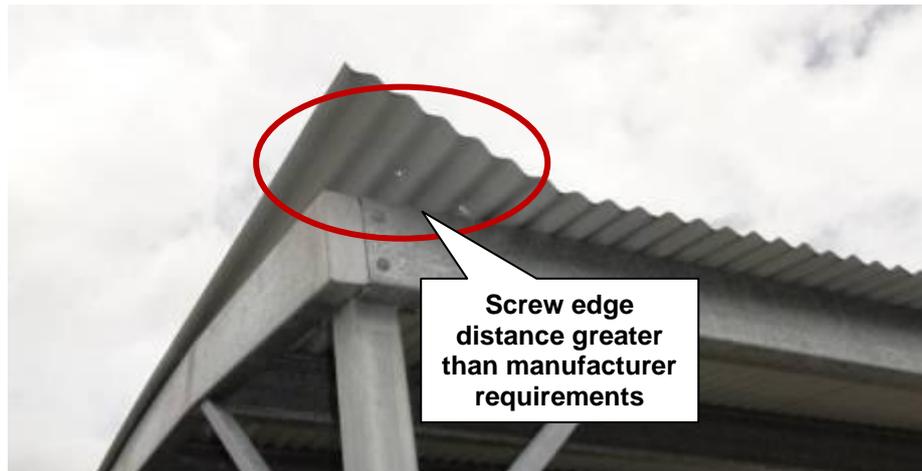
Large edge distance led to fatigue failures in sheeting
